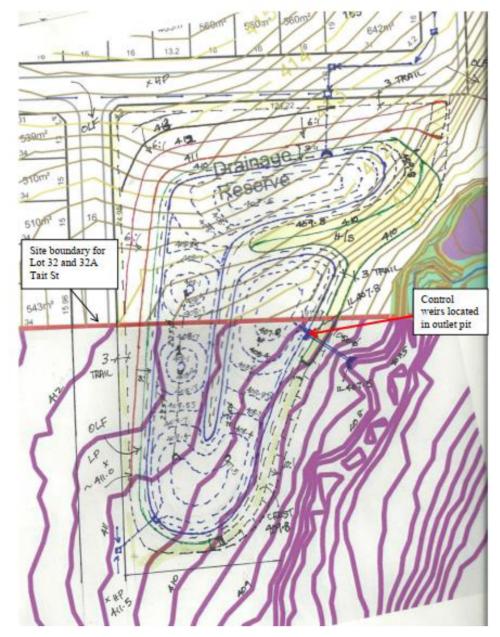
RETARDING BASIN 18 LAYOUT
